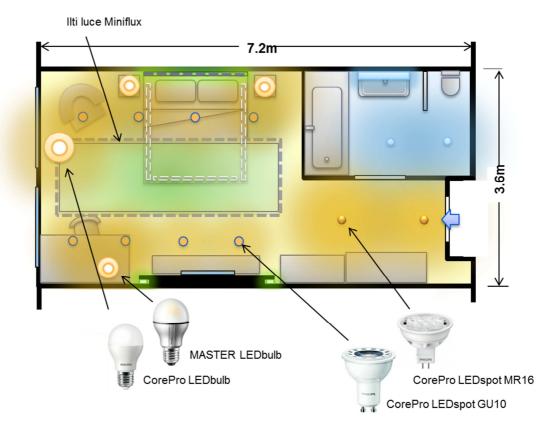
EXAMPLE OF LIGHT PLAN OF GUESTROOM
